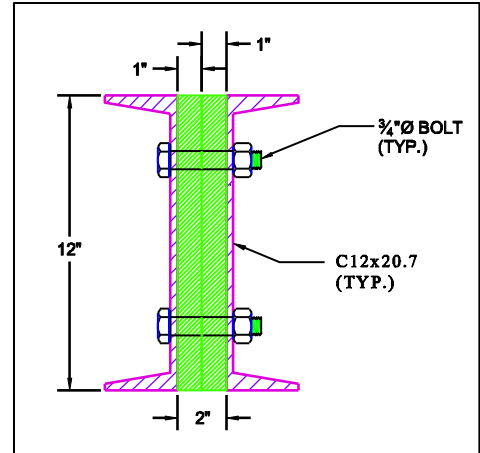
Parallel plane cross section view of load bearing assembly at Section Type C and Section Type D (Hampe, 2012)
